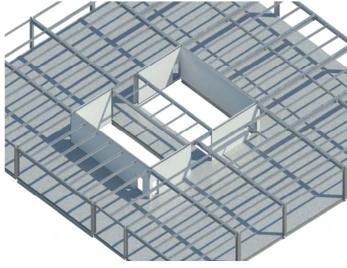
STRUCTURAL LAYOUT FOR TYPICAL OFFICE FLOOR
